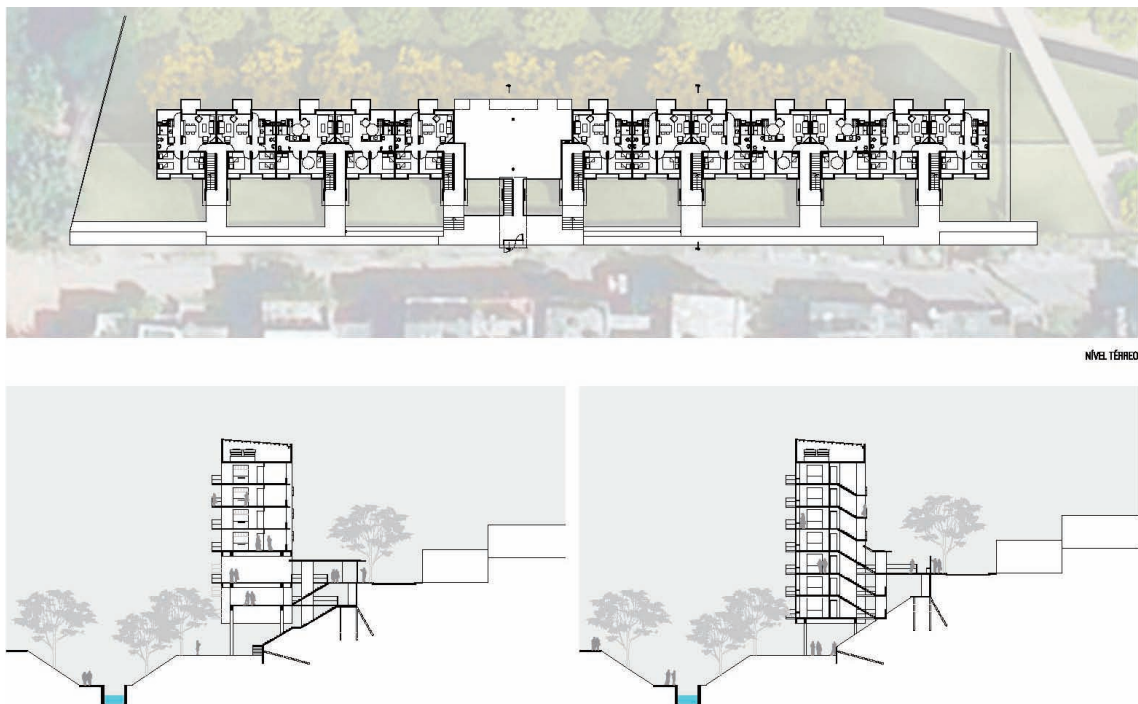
Groundfloor layout and sections of one of the blocks (by courtesy of Brasil Arquitetura)
